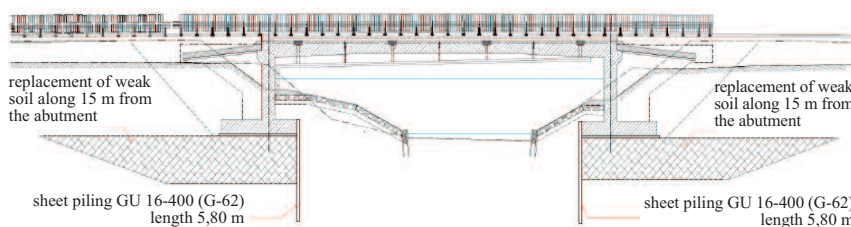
Project under review – TRENCHMIX technology. Base on „Technological design for ground reinforcement under the MD-1 structure and on the approaches to the structure using soil-cement panels in CDMM technology” for an investment to extend voivodship road 878
